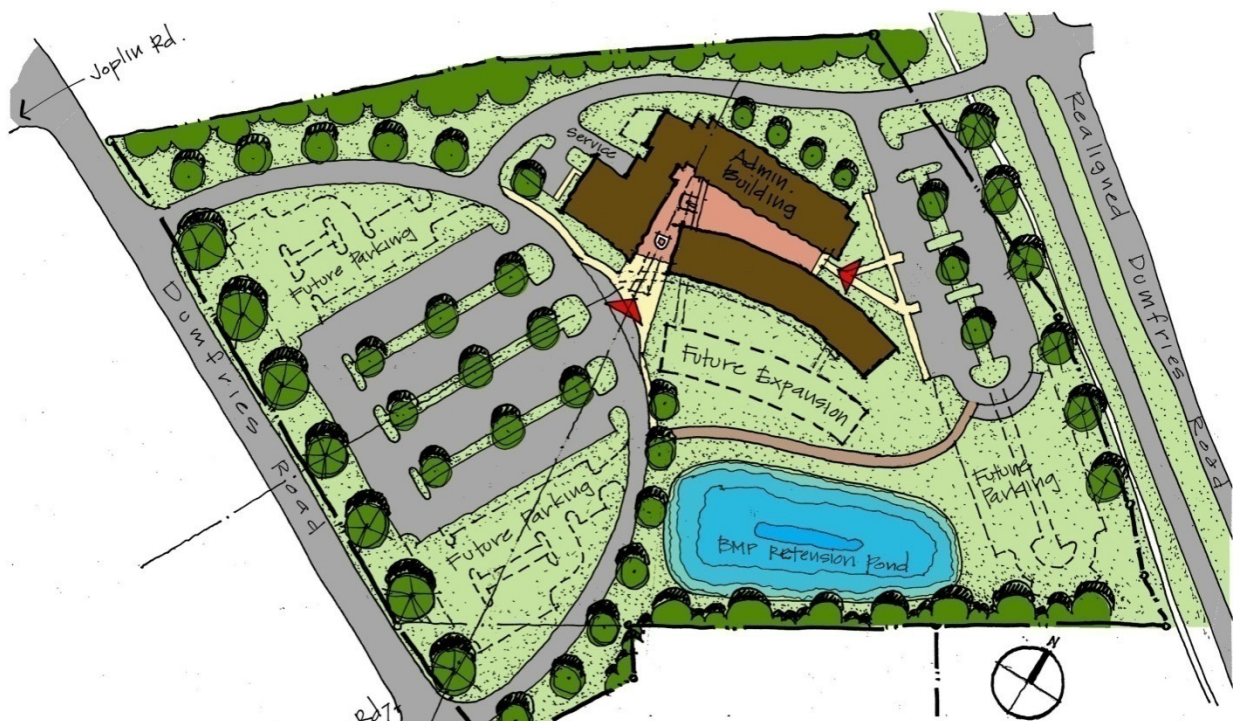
Building Site Plan with Outline of Originally Proposed Future Expansion.
